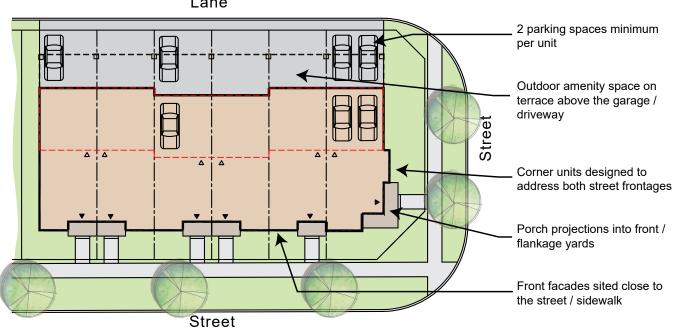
Conceptual Demonstration Site Plan For Rear Lane Townhouses
